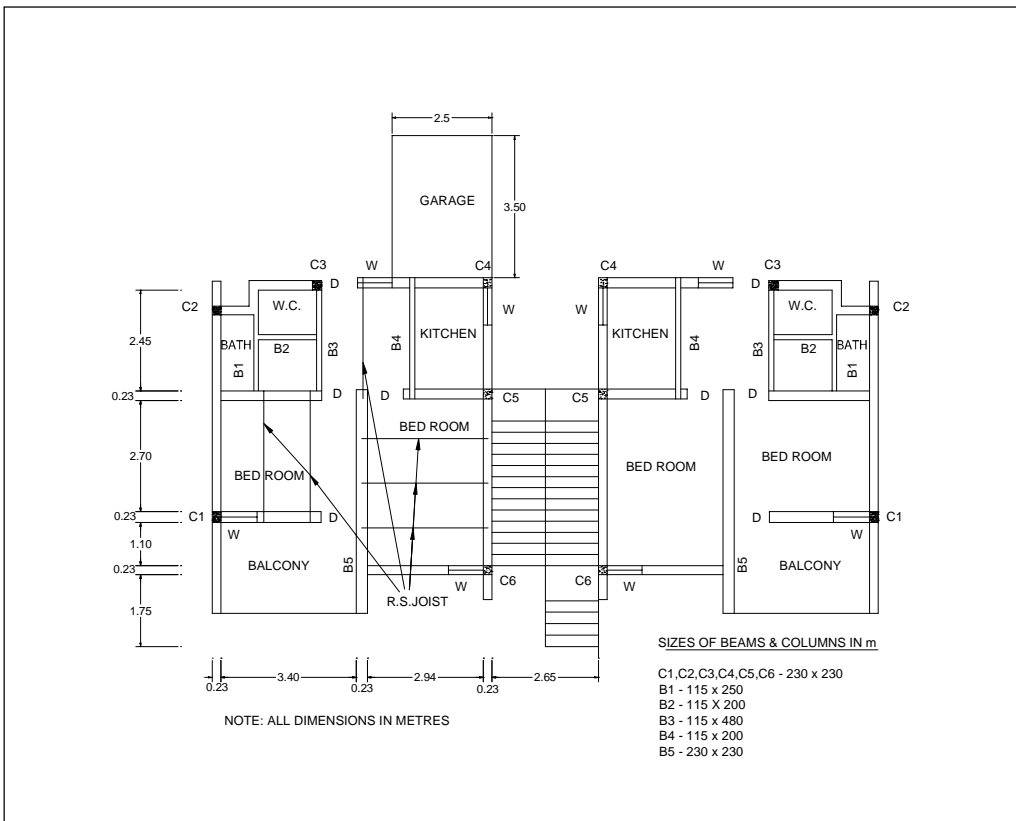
Typical Floor Plan of a Pair of Residential Type-II Qrs
